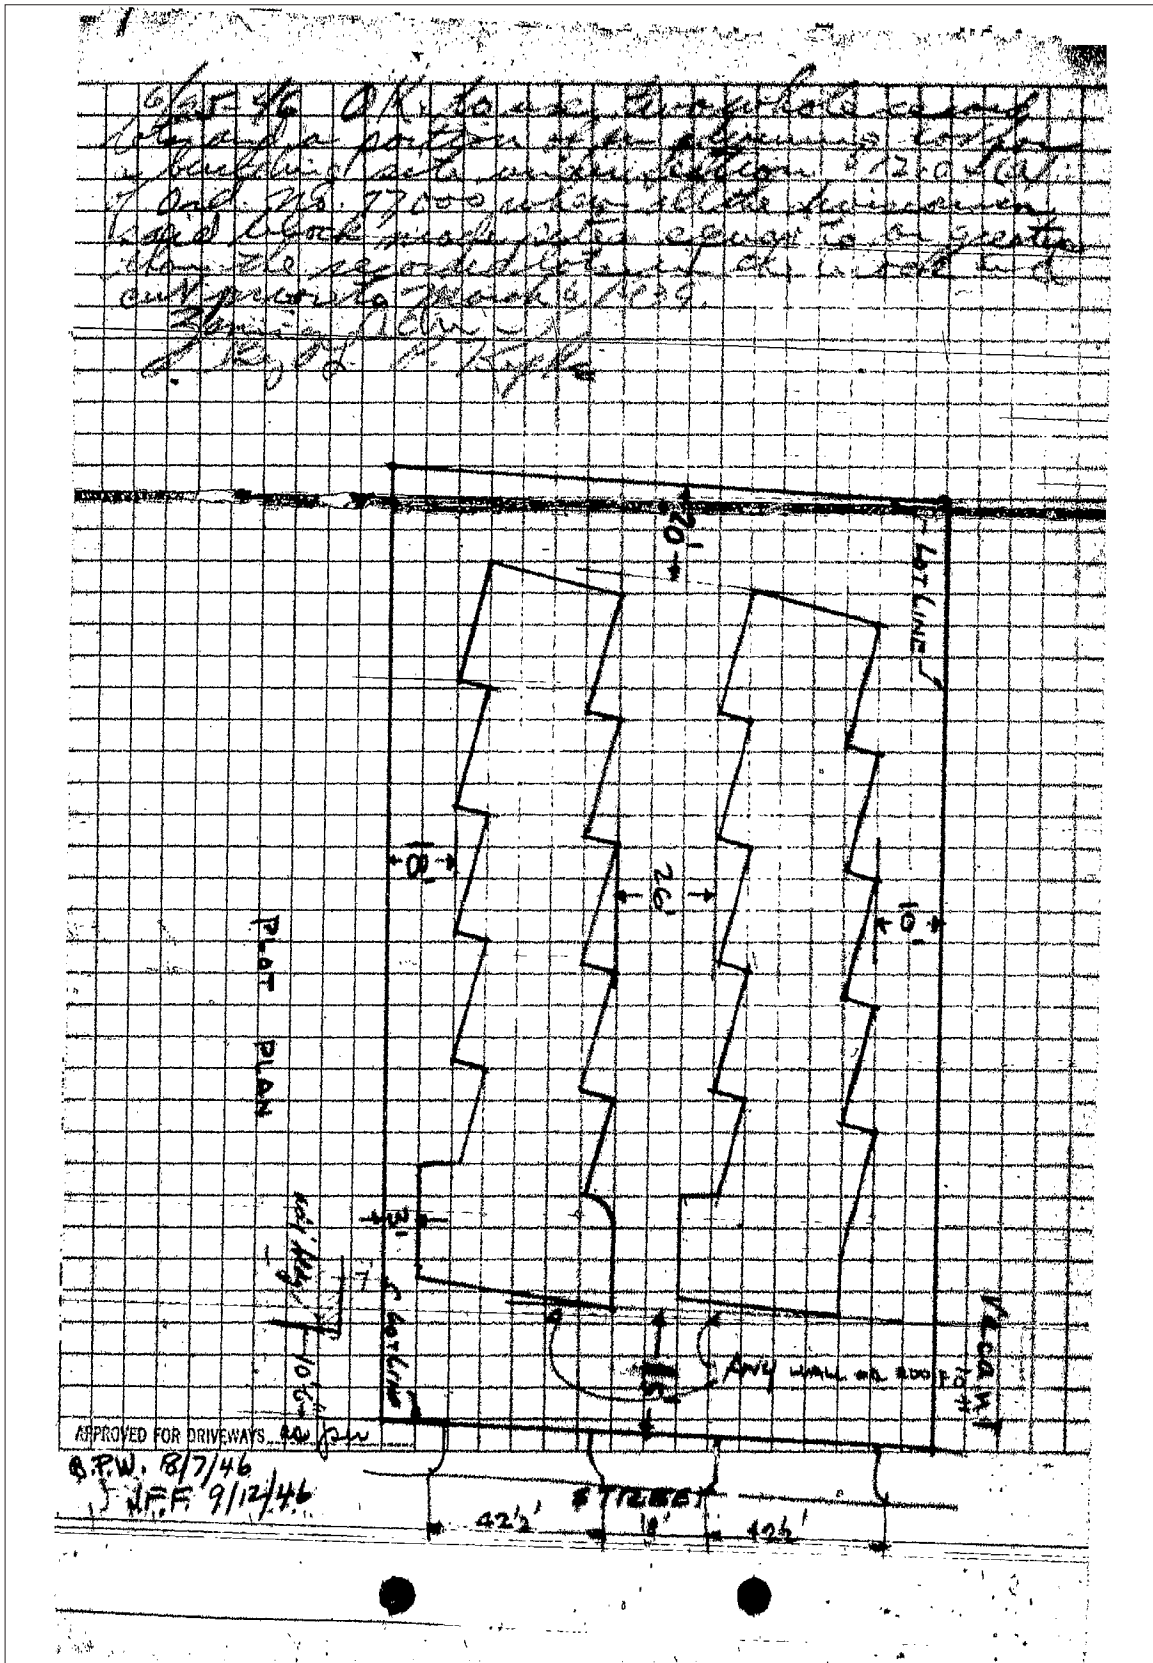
Plot plan attachment for original building permits (City of Los Angeles Department of Building and Safety (LADBS), 1946)
